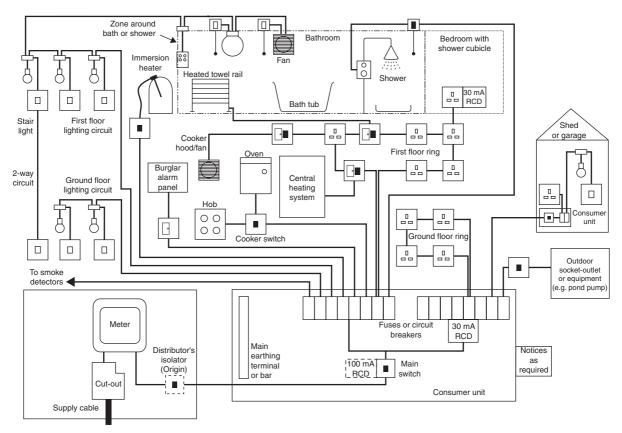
Typical fixed installations that might be encountered in new (or upgraded) existing dwellings
